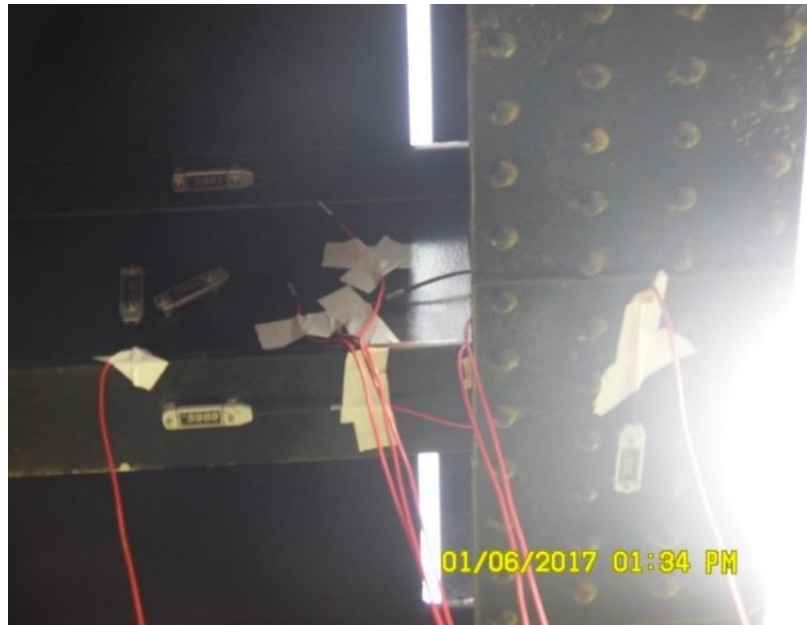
Photo showing BDI-1 to BDI-4 and BDI-8 installed on the bridge.
